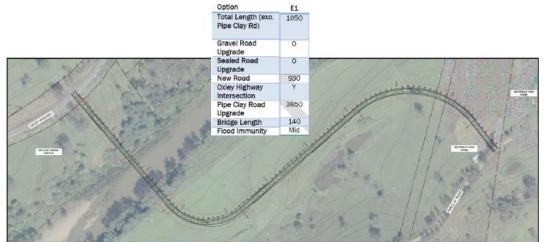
Option E1: Oxley Highway to Pipeclay Road Alignment A west of Long Flat
